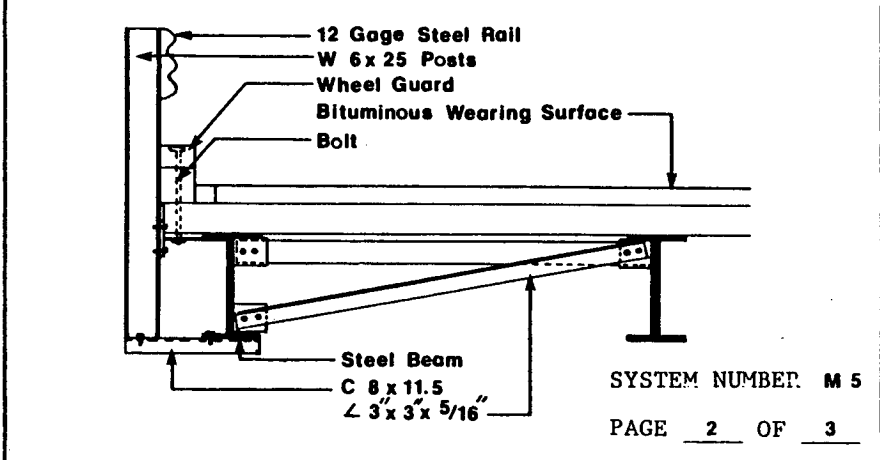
Steel Rail and Post Connected to Deck and Exterior Beam
